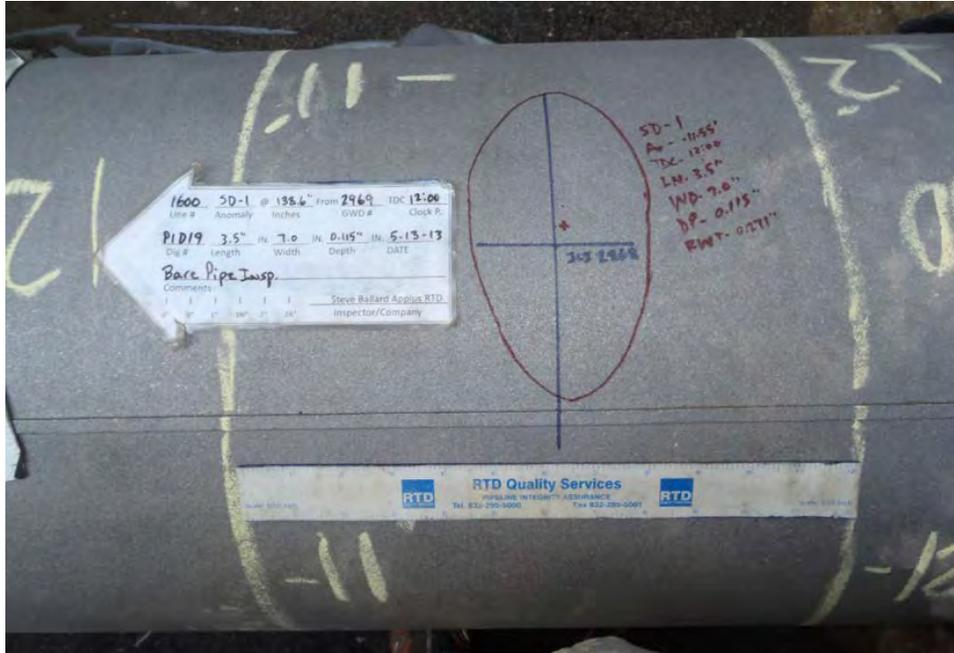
External Appearance of the Flash Welded Pipe Seam on Line 1600
